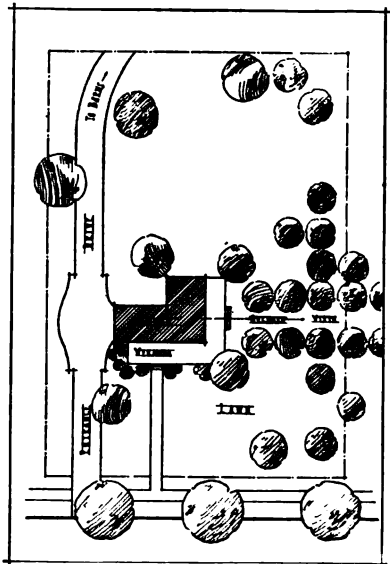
Plan showing the relation of an orchard vista to the outlook from a house
